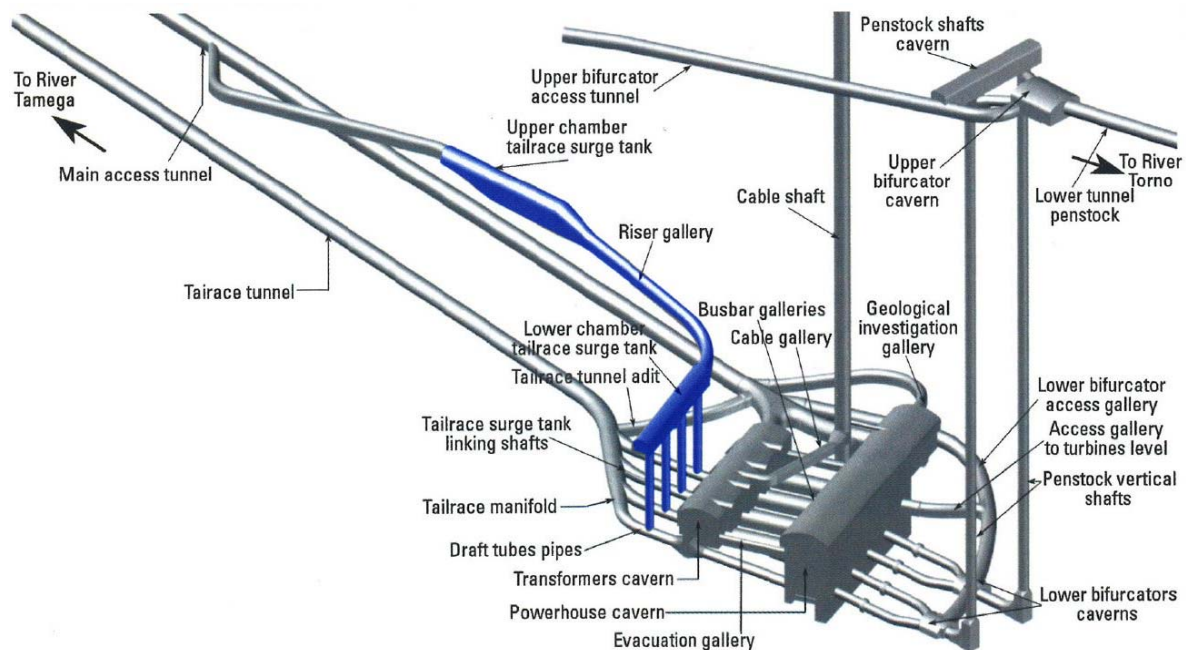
General 3D layout of the underground powerhouse with tailrace surge tank indicated
